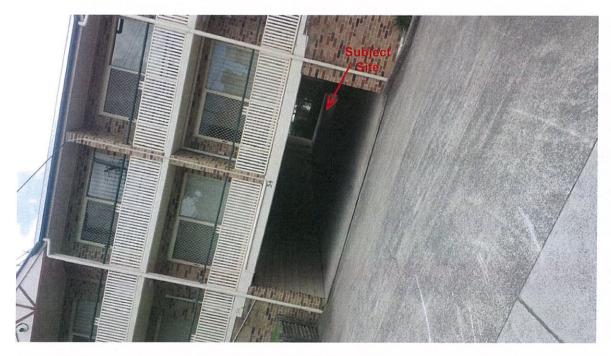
Pavement Area at front of 54 Cintra Road falling to Cintra Road.
